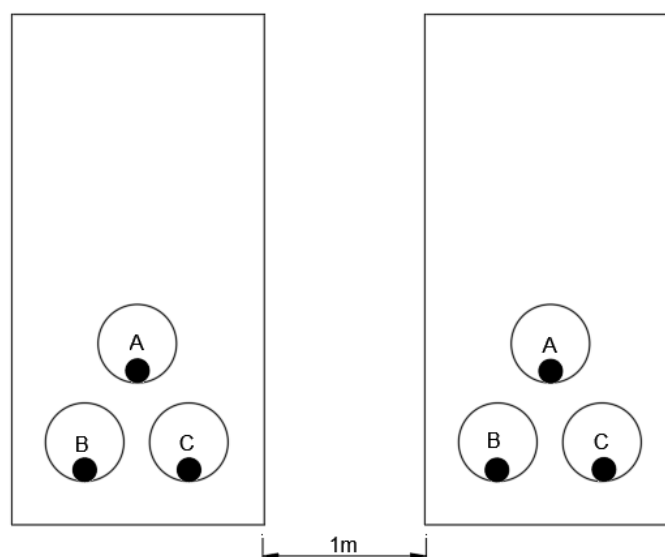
Phasing arrangement assumed for underground 33kV underground feeders
